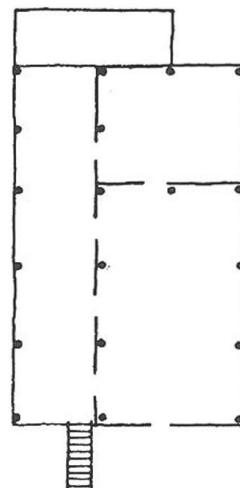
Unit plan and additional bays. Drawing by author and Kristie Spencer.
